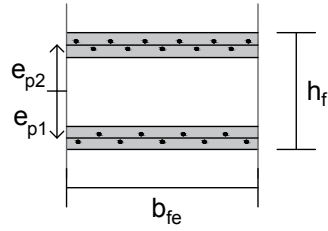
Prestress configuration in the open floor element in y-direction
